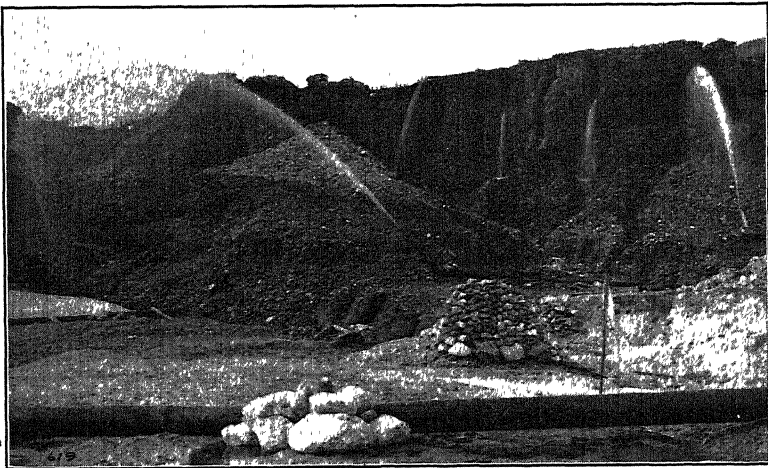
EXCAVATING GRAVEL CONTAINING A GREAT AMOUNT OF ICE.
